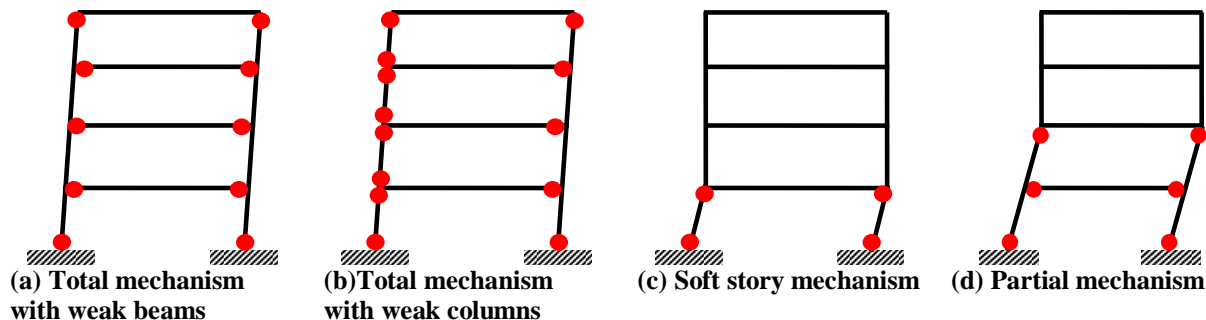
Failure Mechanisms of Reinforced Concrete Frames
